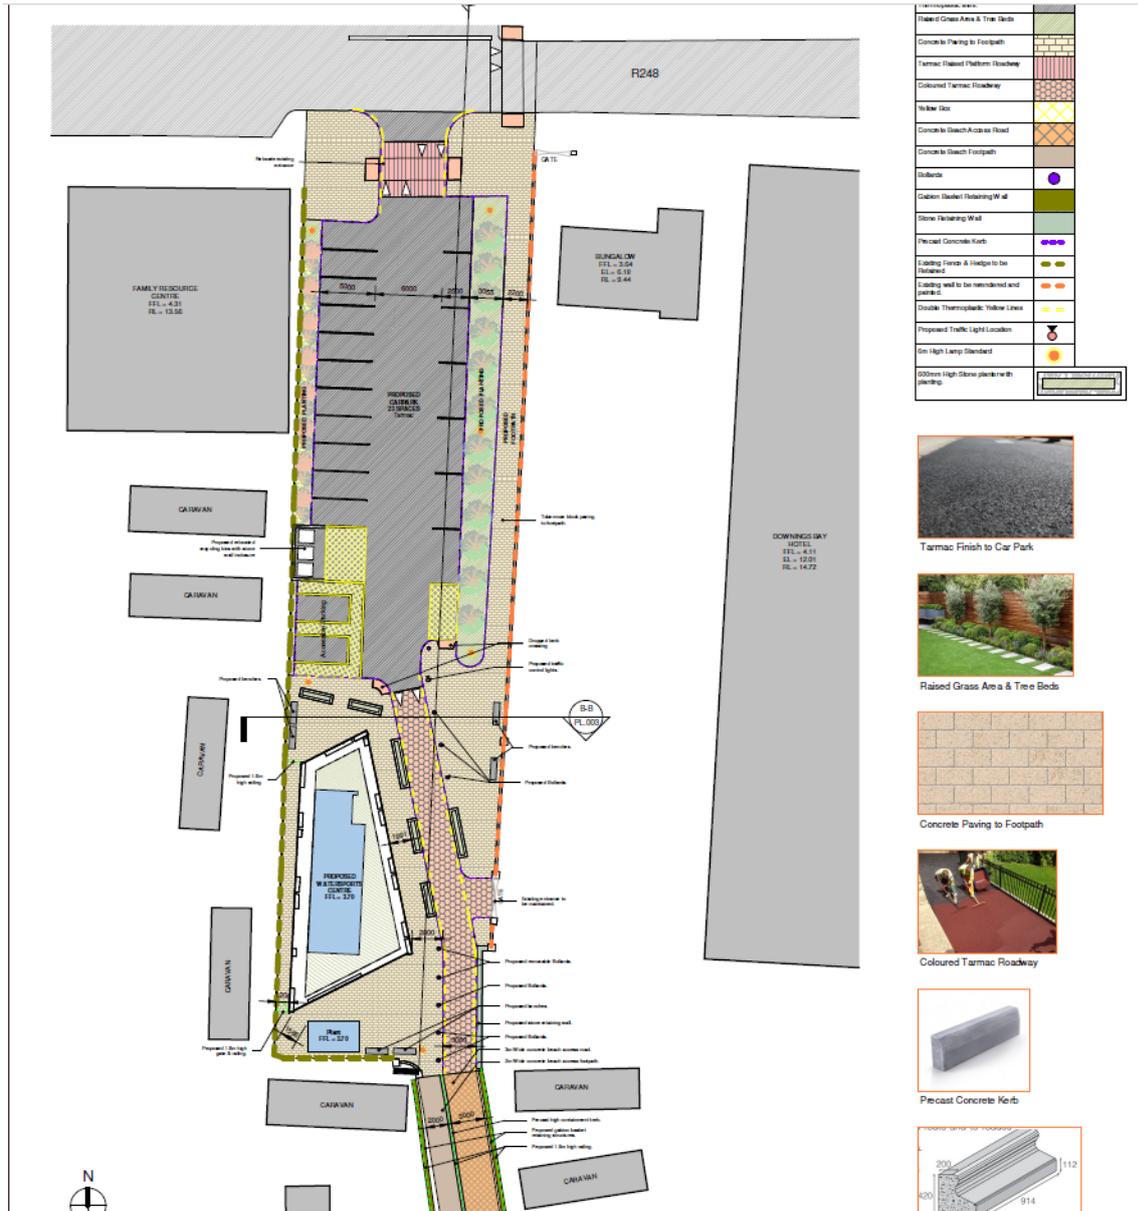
Platform for Growth: Downings extract from site layout plan, as supplied by Paul Doherty Architects Ltd. (Not to scale).
